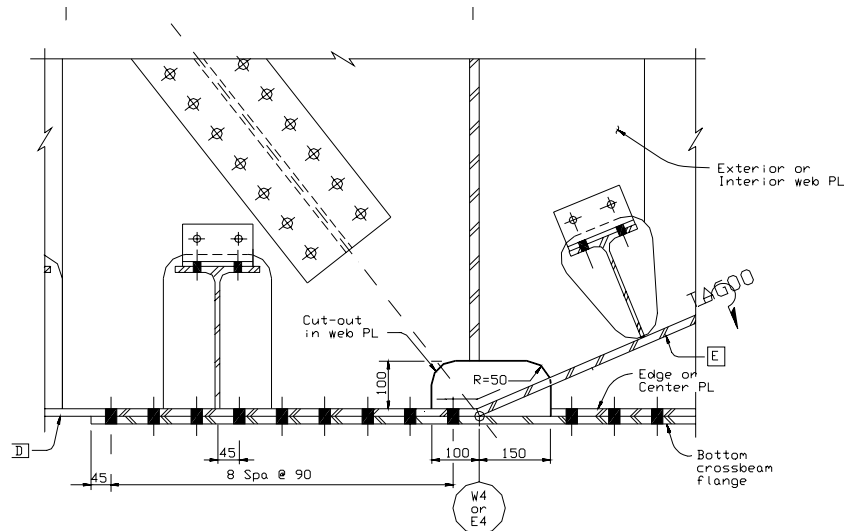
Cross Beam Connection to the Box Girders (bottom flange)
